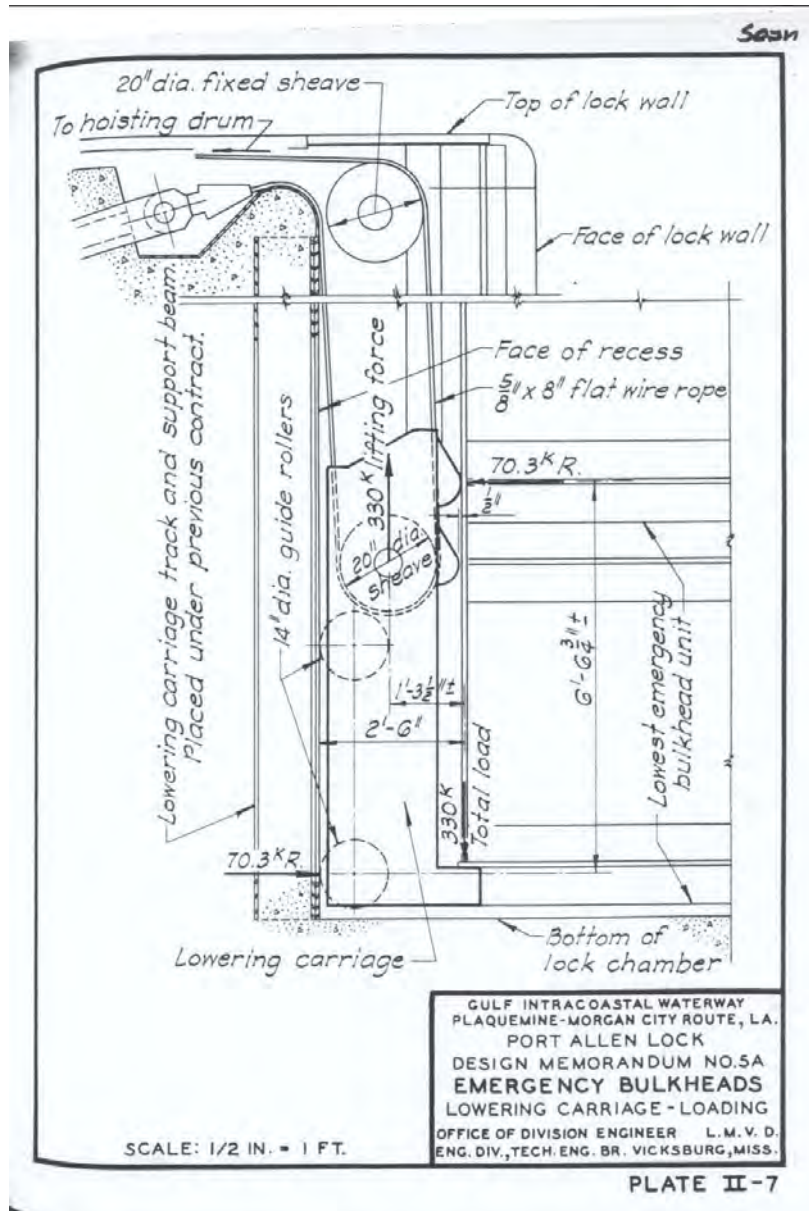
Lowering carriage assembly, Port Allen Lock
